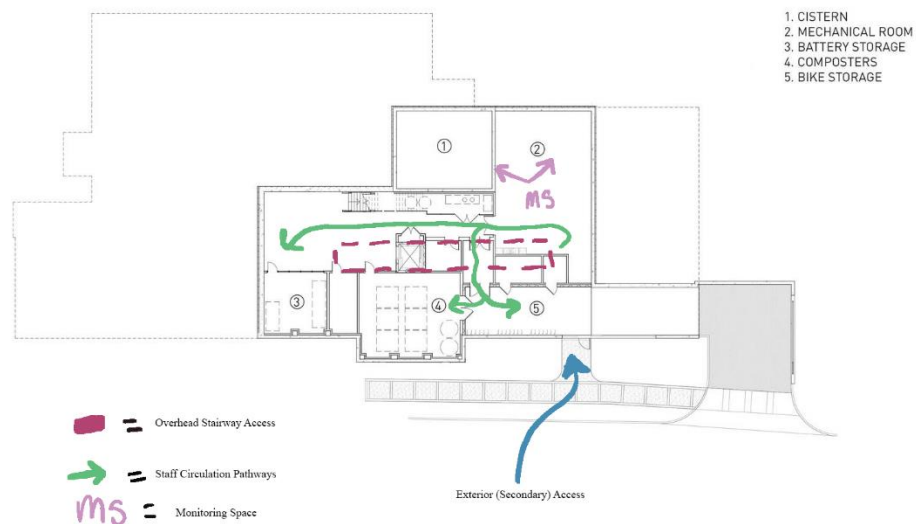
The Kendeda Building for Innovative Sustainable Design (Basement Floorplan). Adapted from Archdaily
